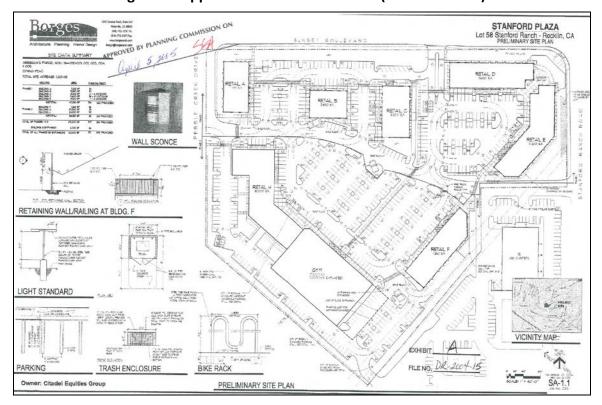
Approved Sunset West Lot 58 (Stanford Plaza)
